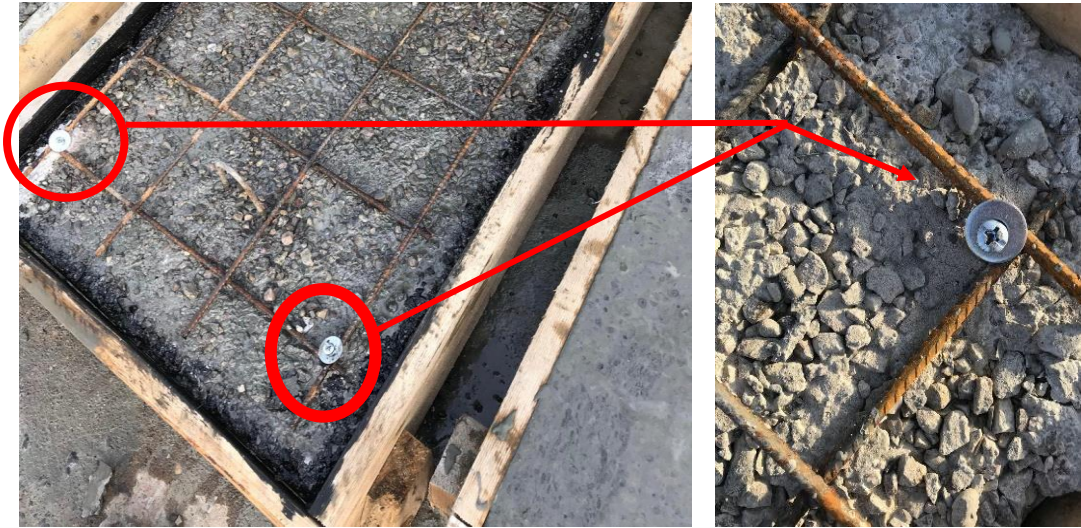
Steel layer embedded into the substrate concrete through the steel bolt and washer
